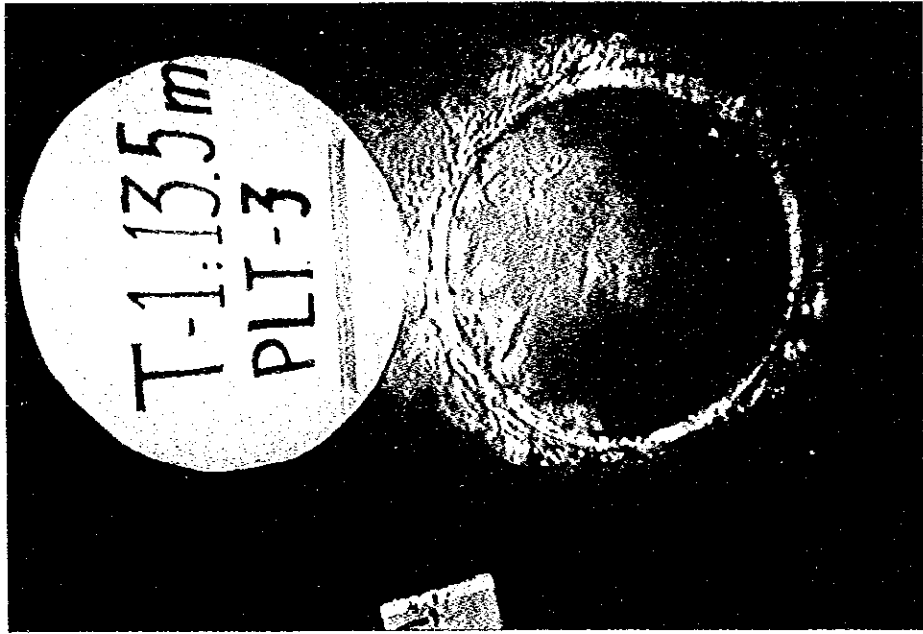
Tested Rock Surface Photograph for In-Situ Plate Loading
